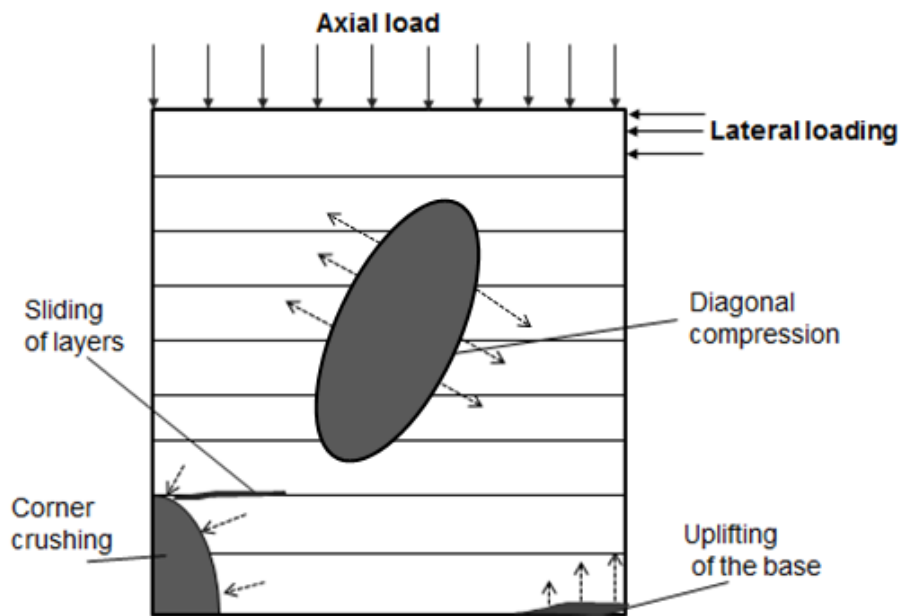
Summary of all the failure modes of rammed earth walls subjected to shear
